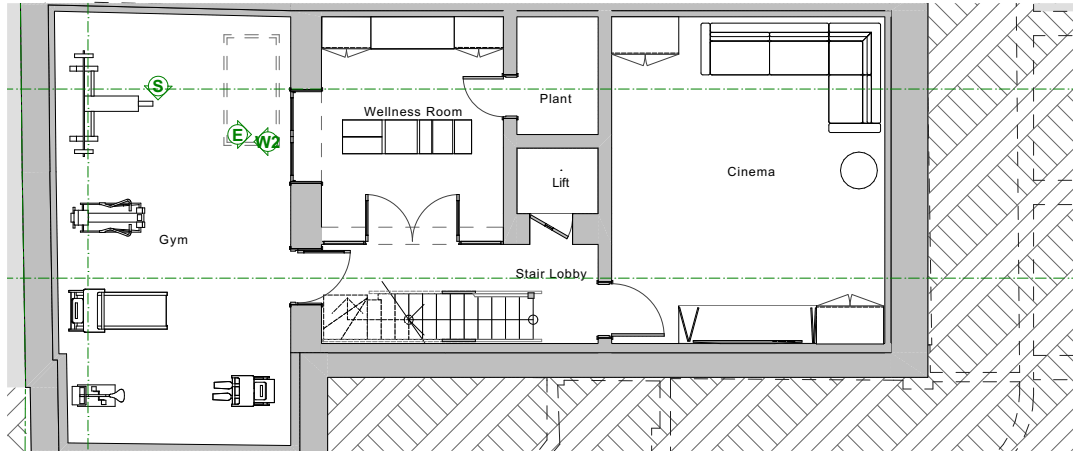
Plan of originally proposed basement (23/03312/FULL - not consented)
